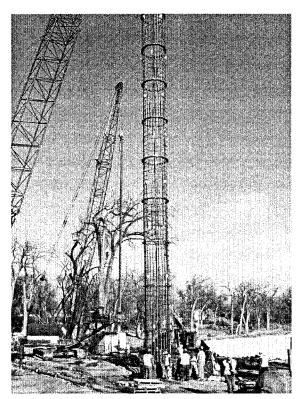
Placement of Steel Reinforcing Cages – Reeves Drive Site.
